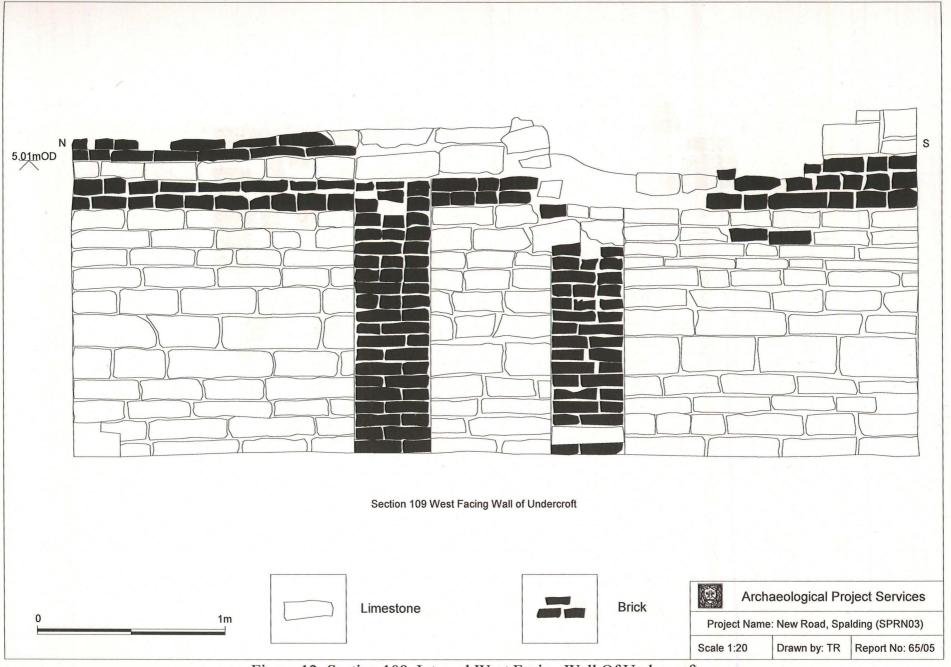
Section 109, Internal West Facing Wall Of Undercroft
